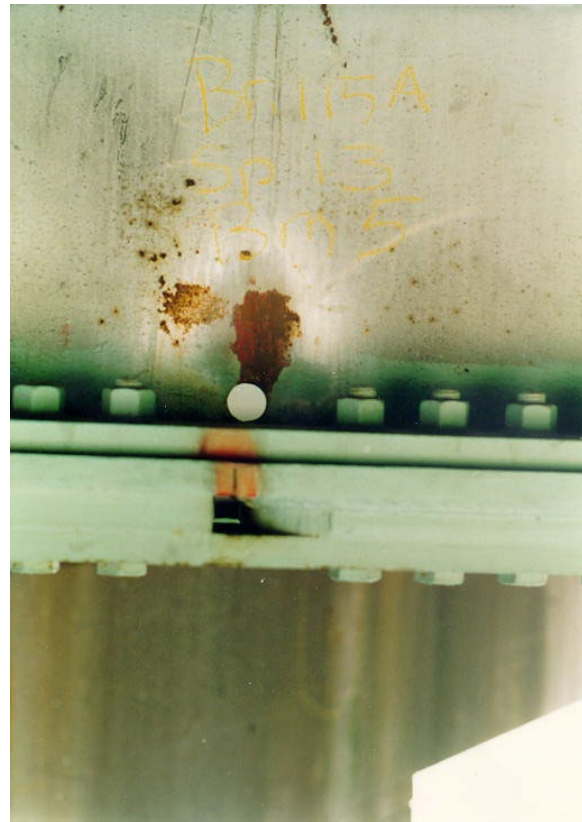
Fatigue Crack Through the Bottom Flange of a Rolled Stringer at the End of a Partial Length Welded Cover Plate. A Stop Hole Has Been Drilled in the Web and Splice Plates Have Been Bolted to the Bottom Flange
